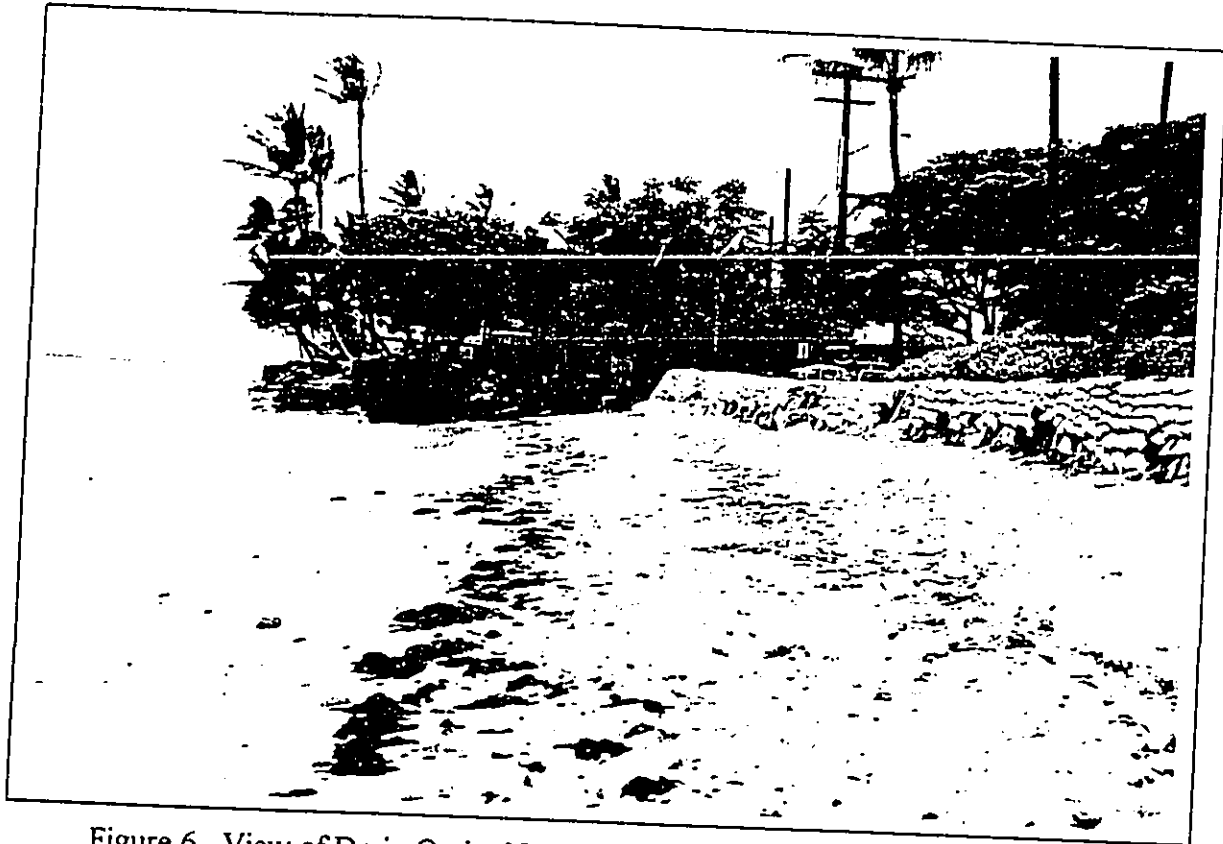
View of Drain Outlet No. 1 location, looking north on Kahana Beach.
